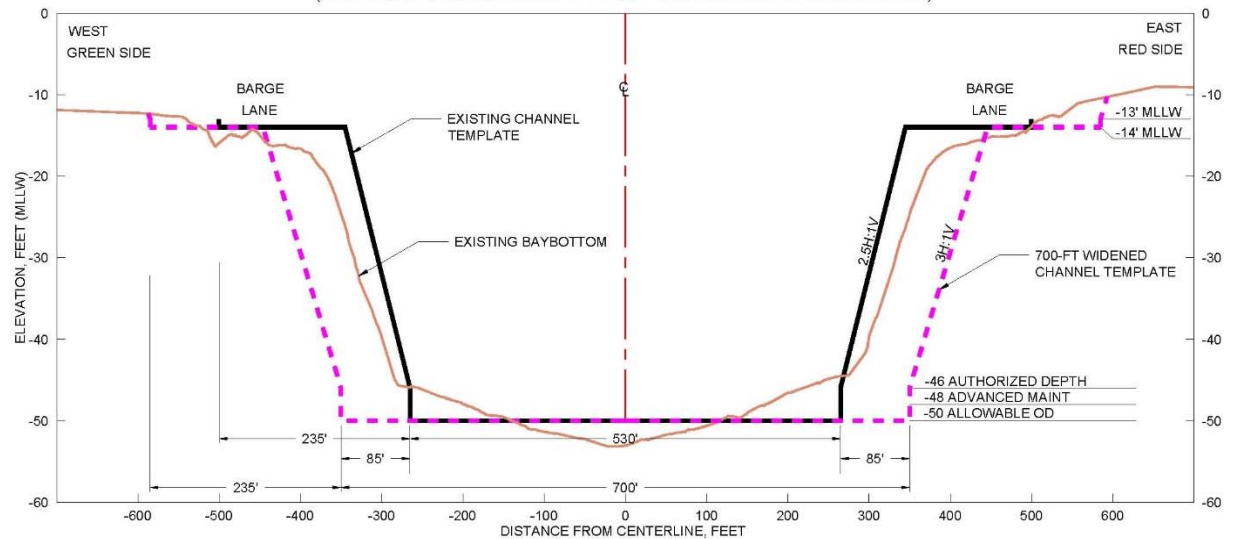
Bay Reach Widening 700 Feet from Bolivar Roads to BCC Cross Section
